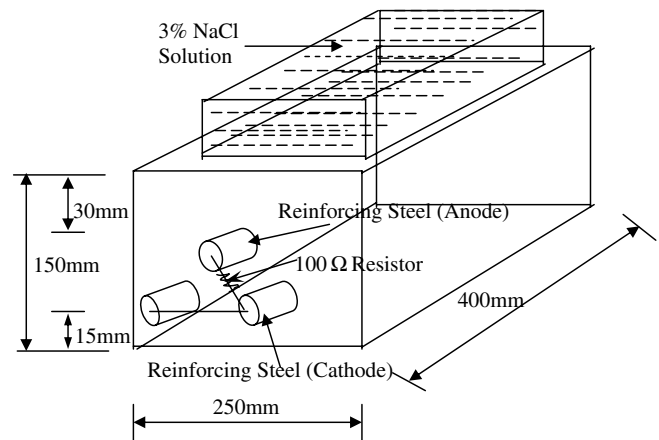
Modified ASTM G109-94a corrosion test prism.
